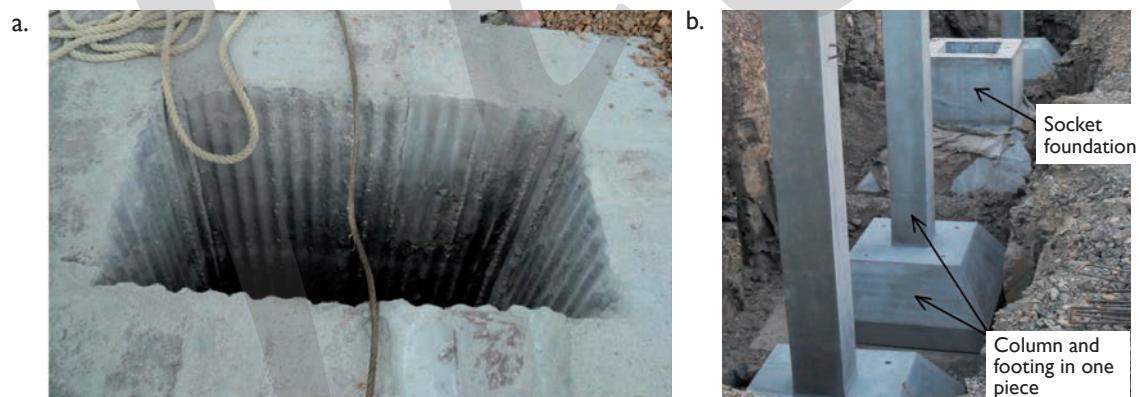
a. Precast socket with roughened inner parts of side walls
